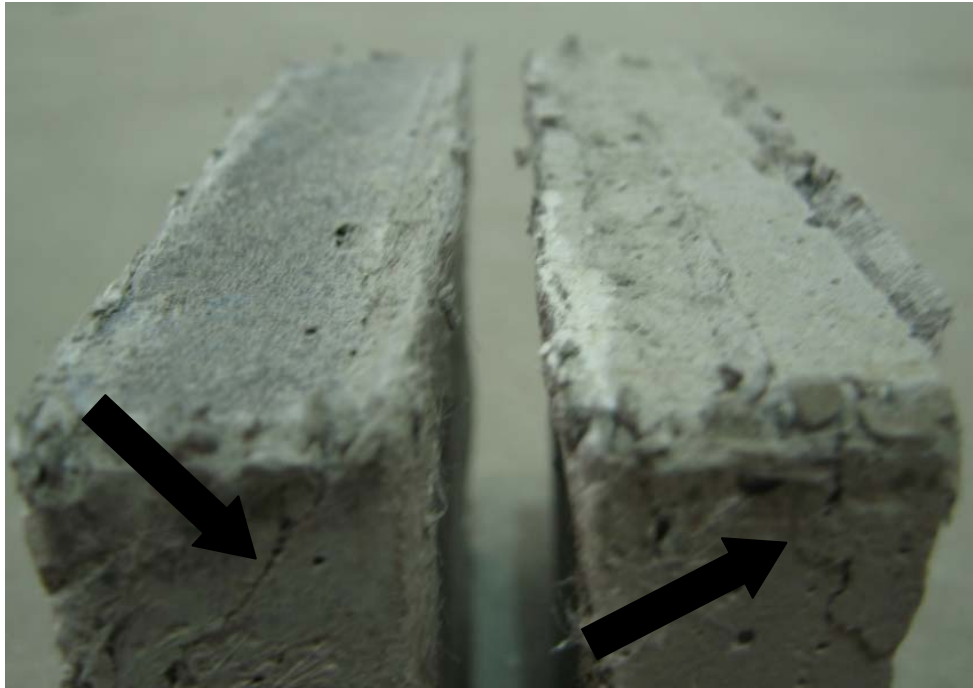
Side view of specimen failure, failure plane or wedge can be seen for solid platens (left) and brush platens (right)
